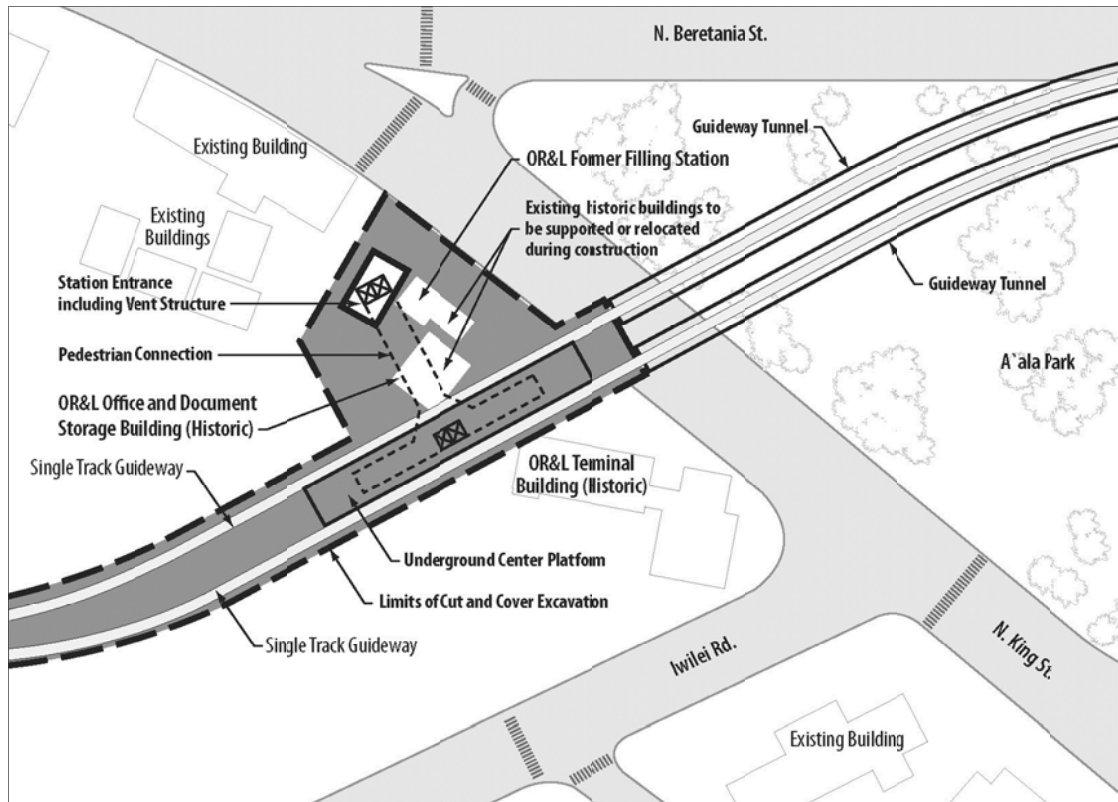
Beretania Street Tunnel Alternative Ka'aahi Street Station
